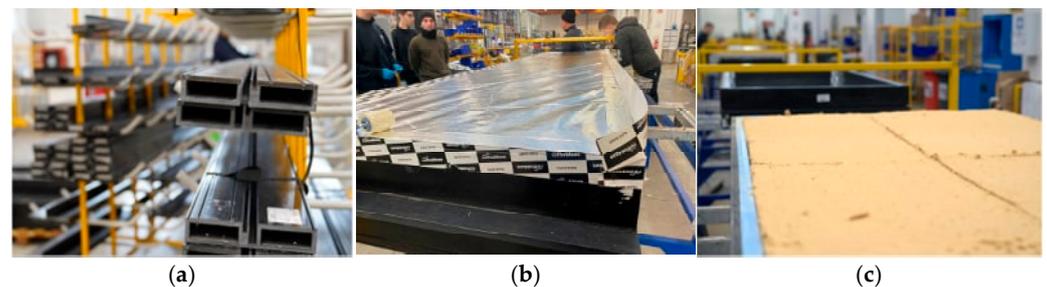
Bio-based profile preparation for façade prototypes after cutting and machining phase (a); membrane and tape application within the façade; (b) and wooden fiber insulation integration (c).
